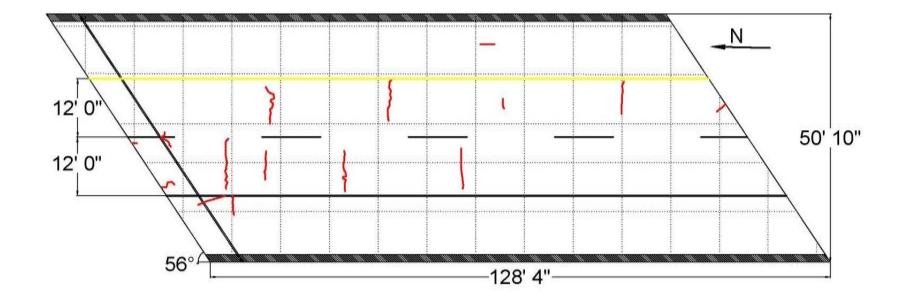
Distress map for Dannon Way southbound conventional concrete deck at 8 months.
